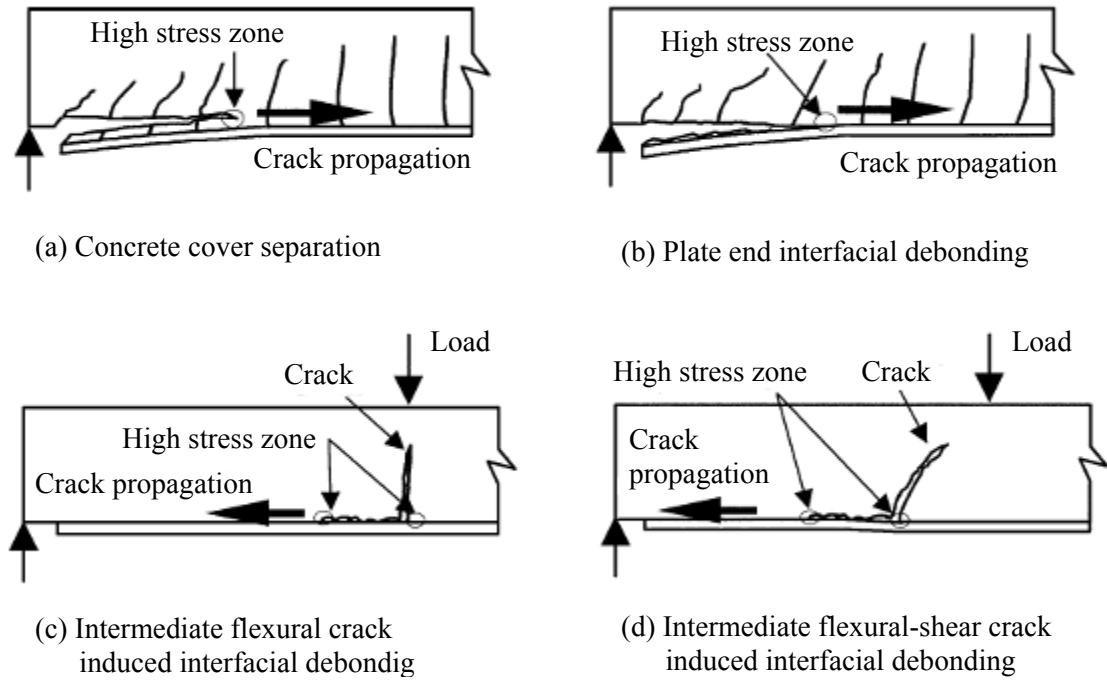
Failure Modes of RC Beams Reinforced Externally Bonded FRP [25]
